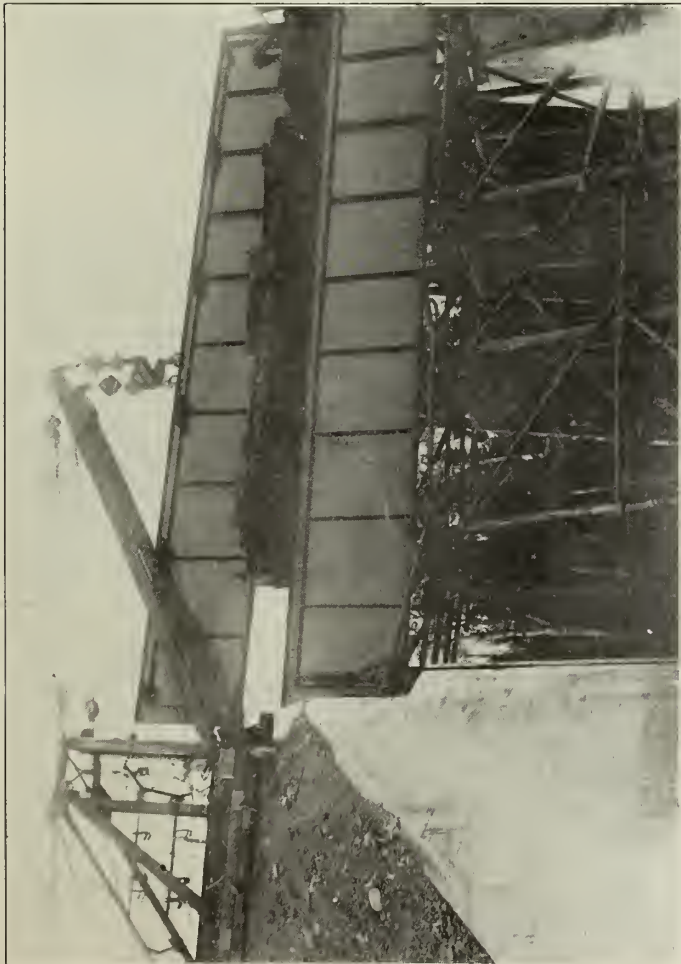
Placing Plate Girders at River Eau Chaude Bridge, National Transcontinental Ry.
